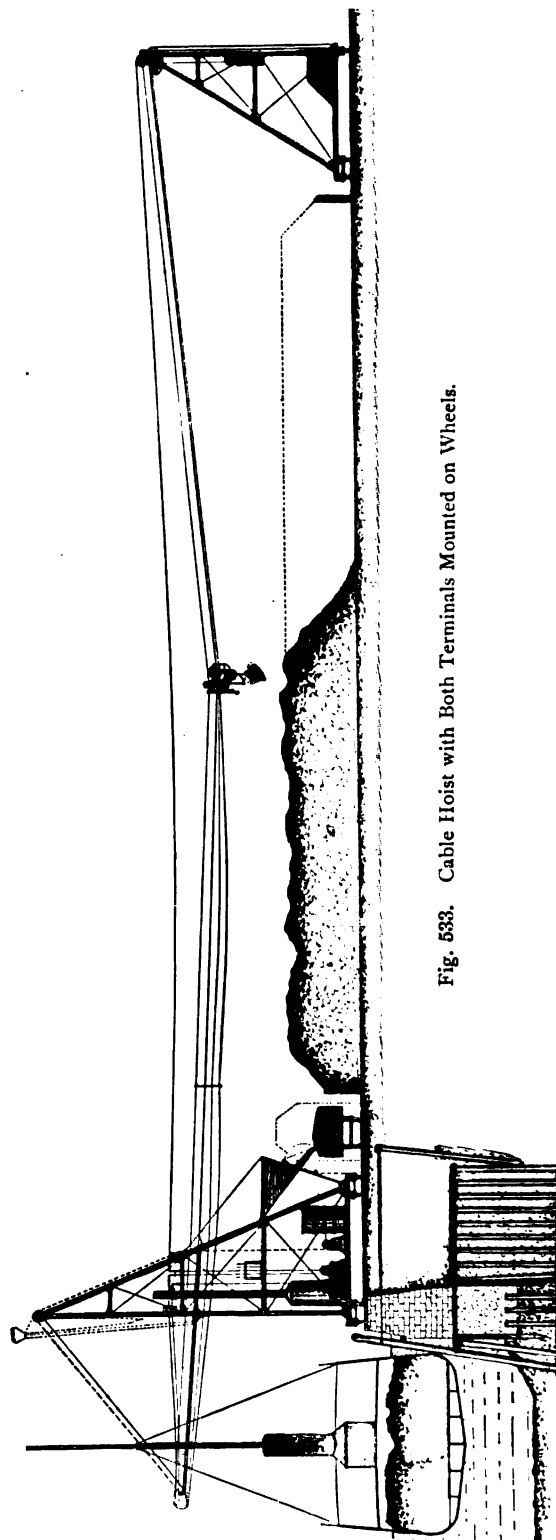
Cable Hoist with Both Terminals Mounted on Wheels.
